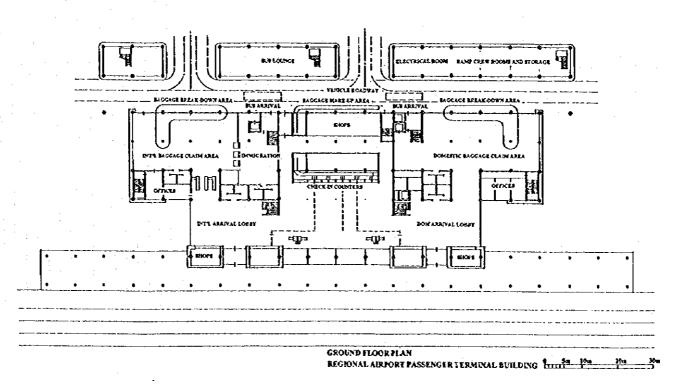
Passenger Terminal Building - Floor Plans
